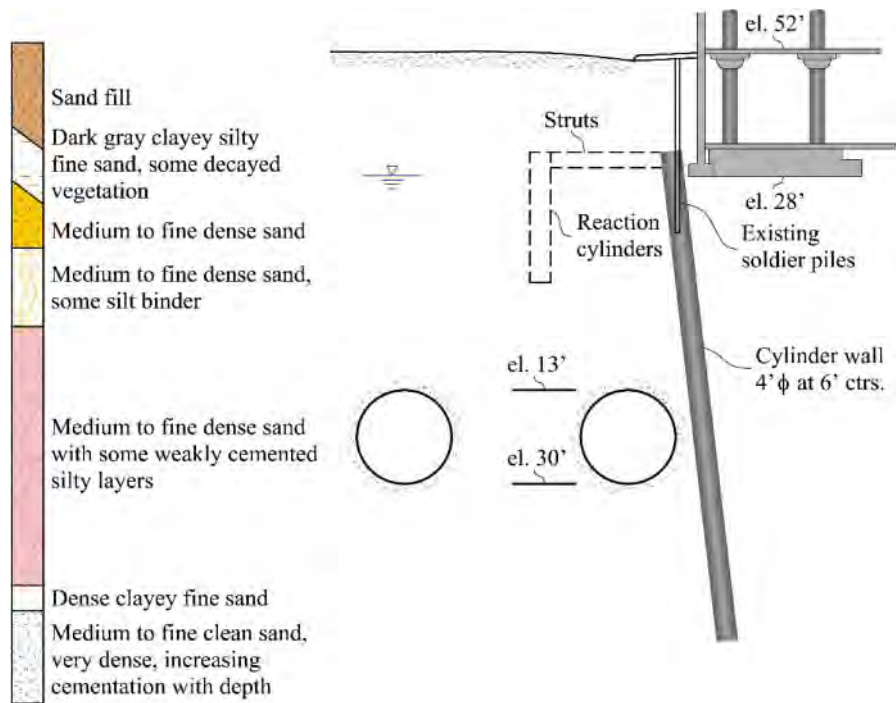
An early example of pile wall to protect buildings against tunnelling induced deformations (Peck, 1969).
